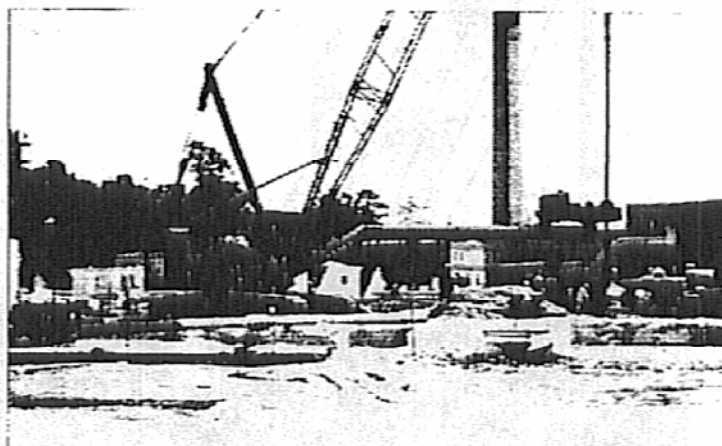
Extended mounting frame (Terra Constructors, 1998).
